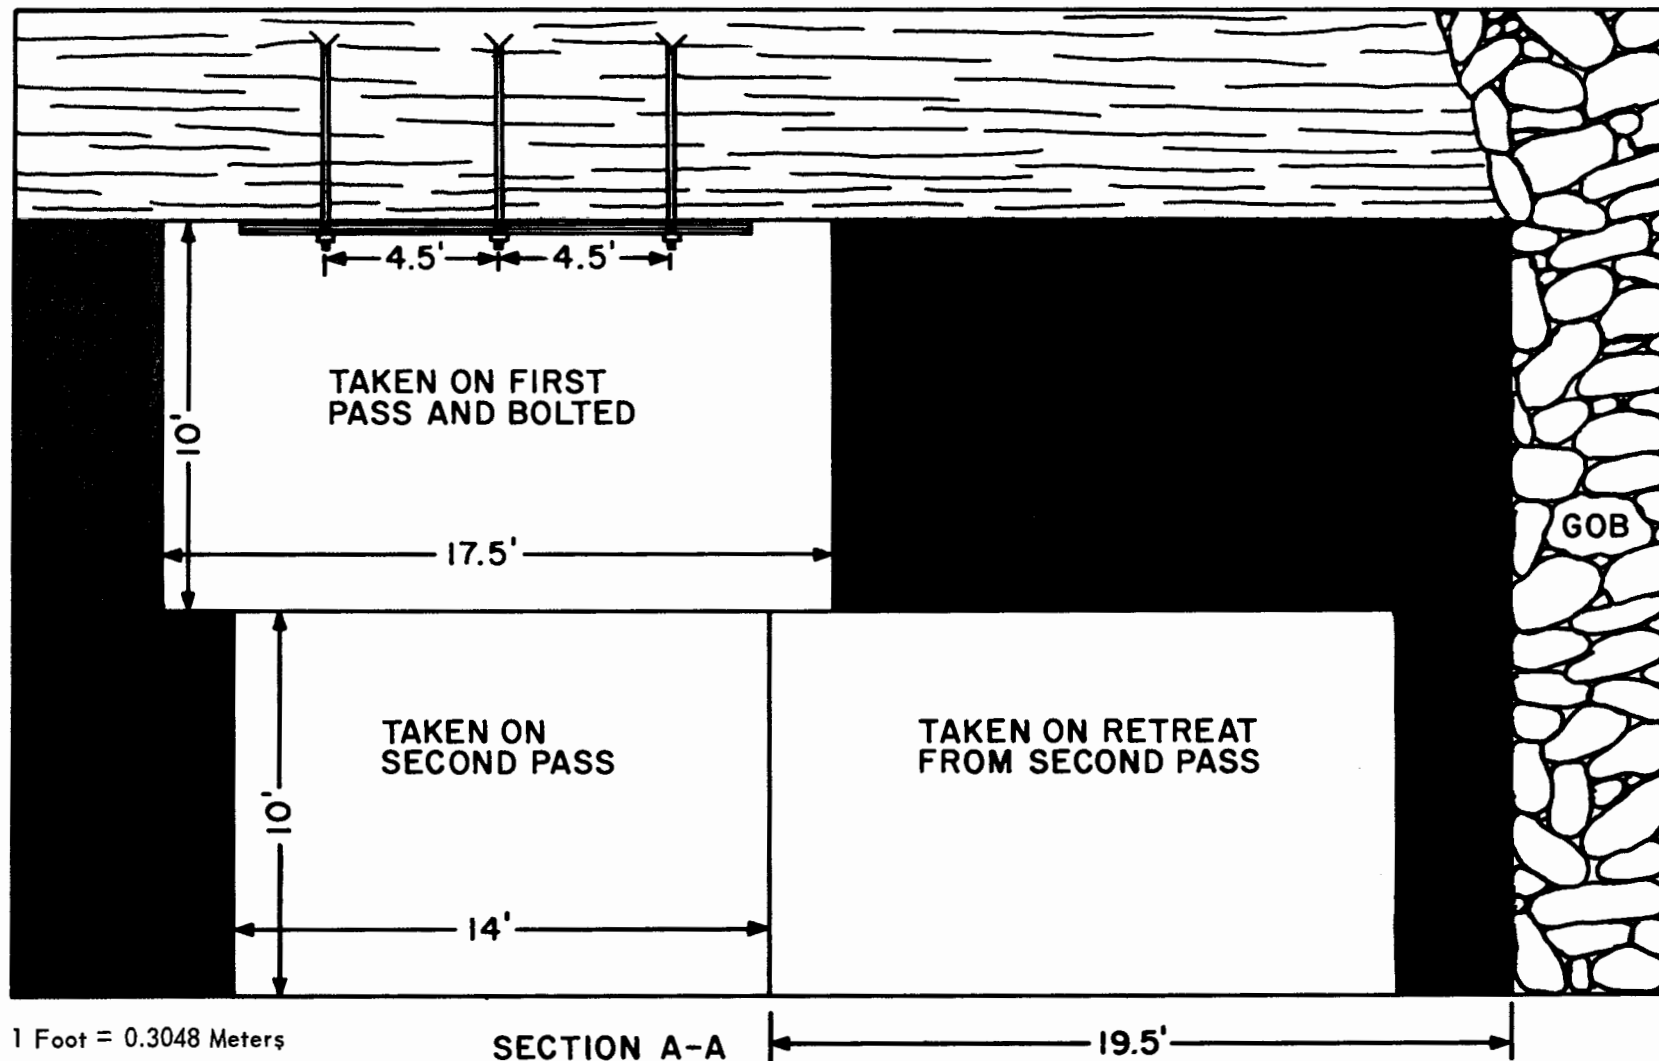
ENLARGED FRONT VIEW OF PILLARING, METHOD A
